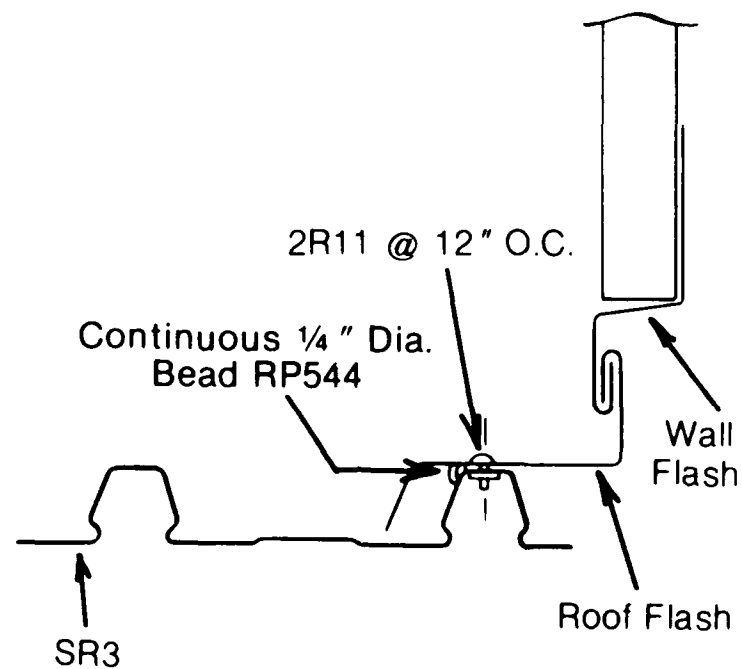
Metal flashing with slipjoint at sidewall example 1.
